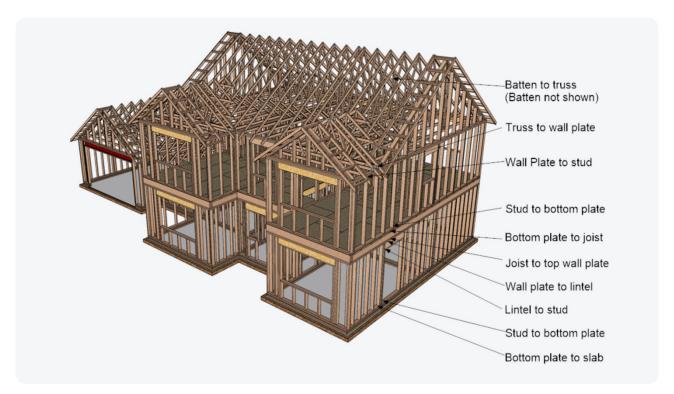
Common fixing locations in lightweight timber-framed construction. (Image credit: TDA)
